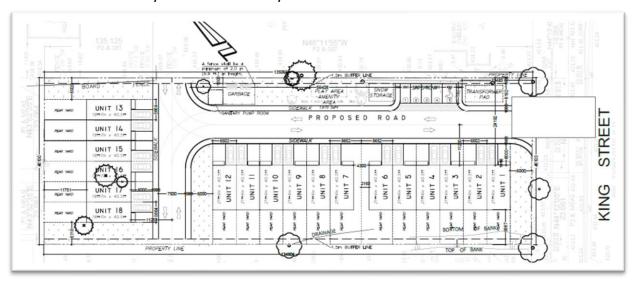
Site plan submitted by Professional Floor Plans Inc, August 10th, 2022
